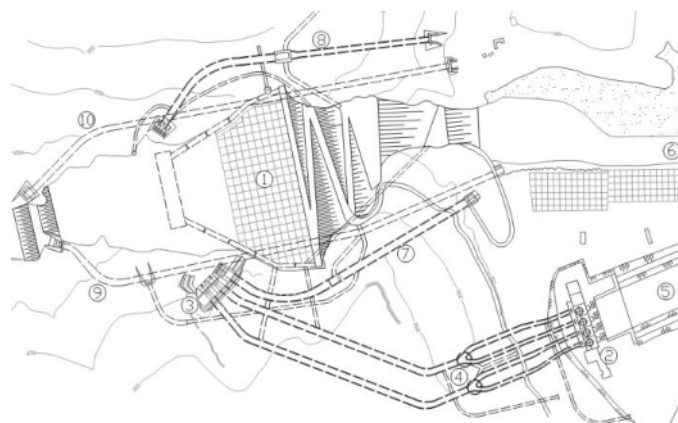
Layout of Koman HPP – (1) Concrete faced rockfill dam, (2) powerhouse, (3) power waterway intake (4) surge chambers, (5) tailwater channel, (6) Drin River, (7) tunnel spillway No. 4, (8) tunnel spillway No. 3, (9) diversion tunnel No. 2, (10) diversion tunnel No. 1
